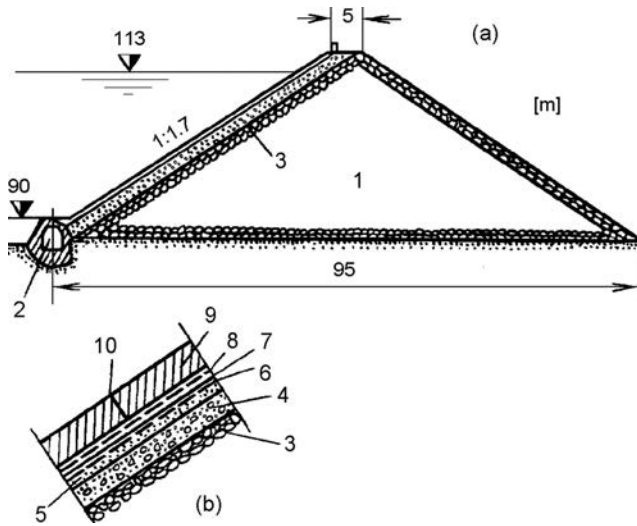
Codolle dam (France). (a) Cross-section of the dam; (b) detail of facing with the geomembrane. (1) Rock-fill 0–1000 mm; (2) gallery; (3) compacted sand and gravel, 2 m; (4) gravel, 15 cm; (5) bedding of cold asphalt, 5 cm; (6) base of geotextile; (7) geomembrane of polyvinyl chloride, 2 mm; (8) geotextile; (9) concrete slabs 4.5 × 5 m, d = 14 cm; (10) joint.
